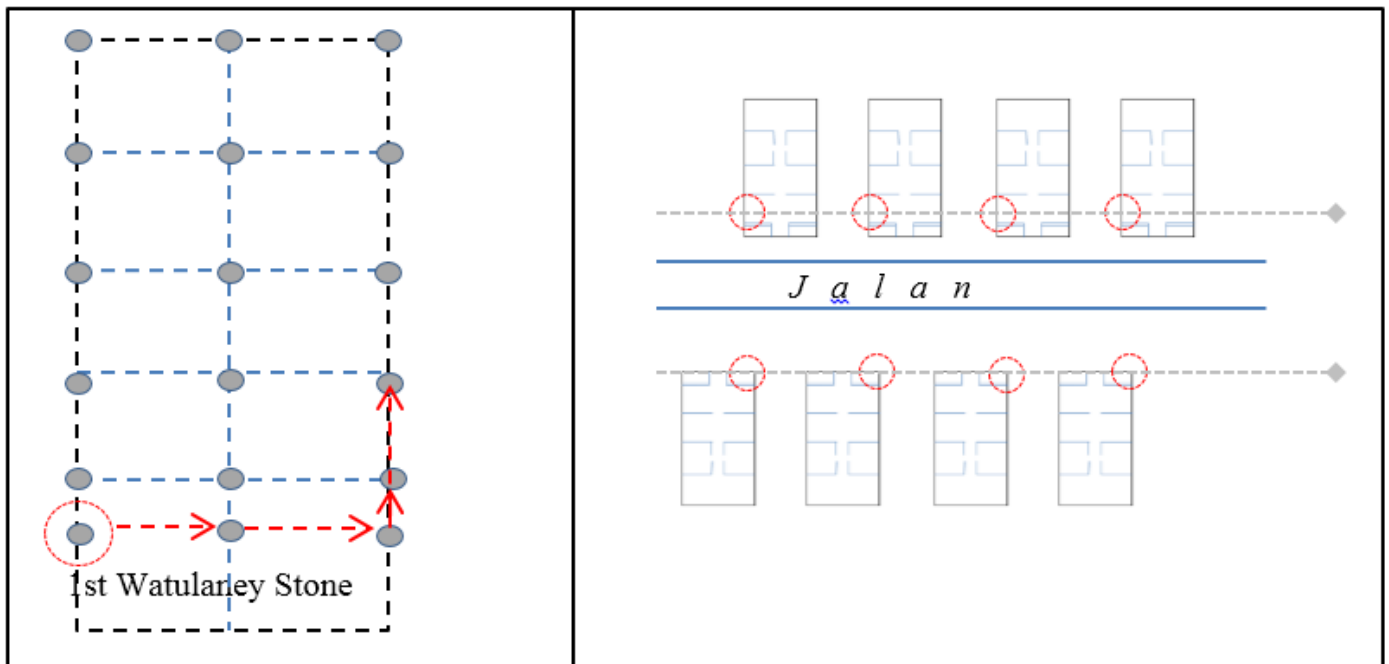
The Tradition of Laying the First Stone Becomes Key of Setting Layout of the Housing Area that is well-ordered
